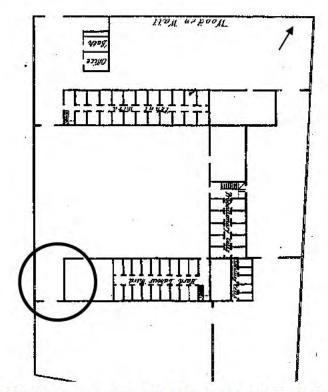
Close-up of 1877 plan of Stockade (AJHR 1877: Session I H-30:11) showing area excavated
